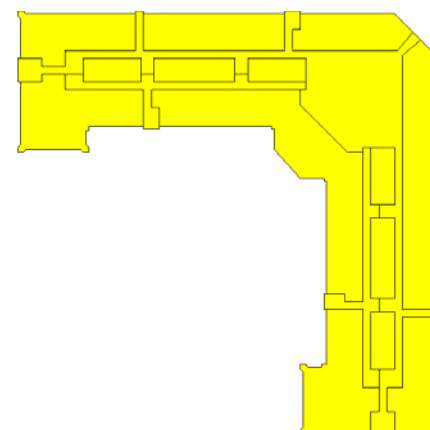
Actual Ground Floor Plan for Al-Waha Shopping Centre
